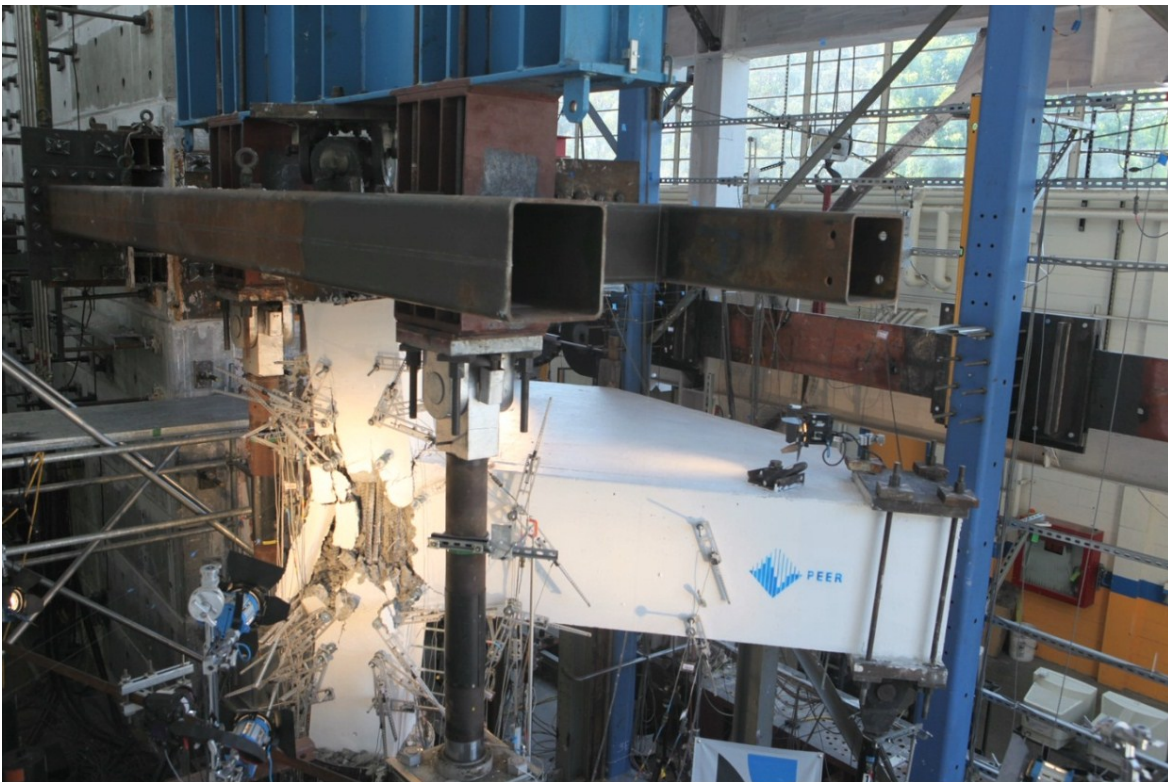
(Continued) North joint face crack development and progression during EW beam loading of specimen U-J-2
